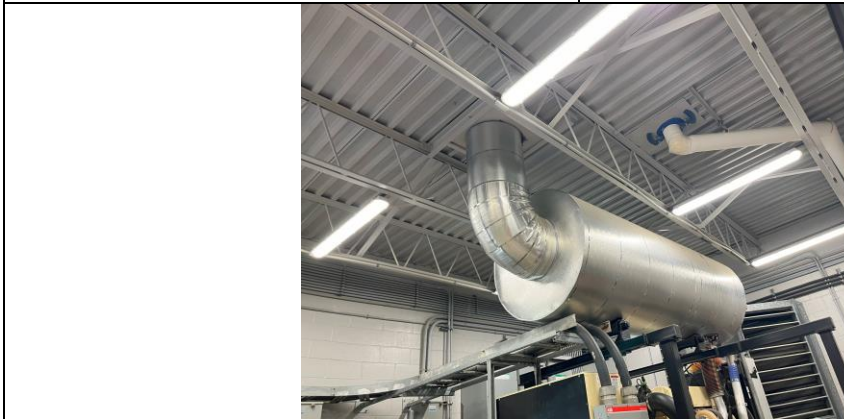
INTERIOR OF EXISTING MILL STREET PUMPHOUSE (CENTER-WEST) SITE
